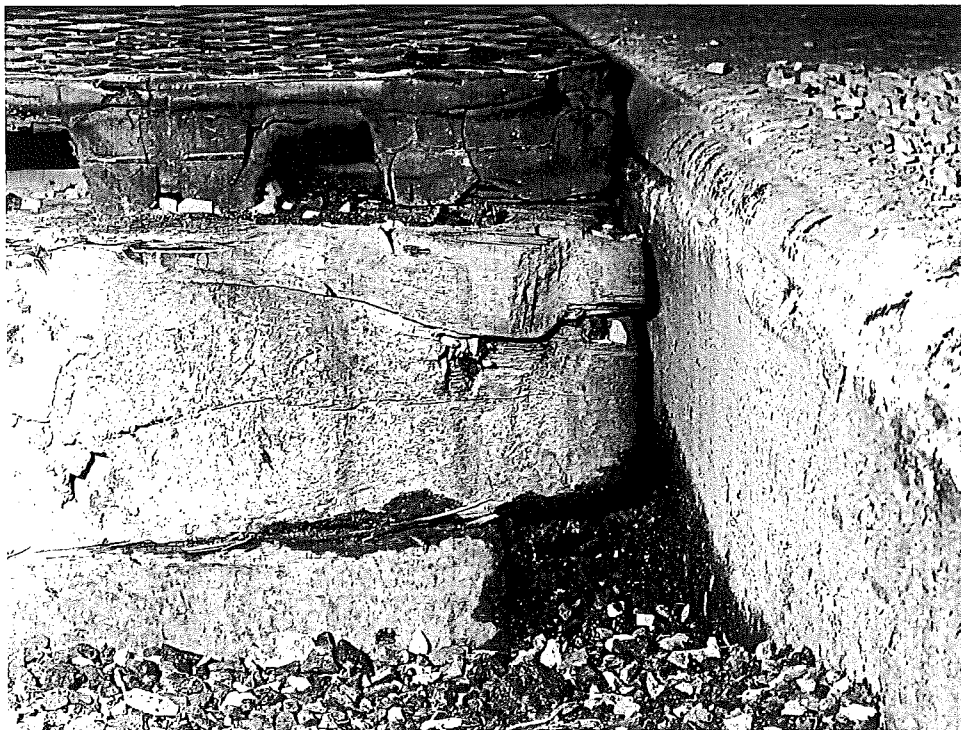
Vertical section of the crossing illustrating shim extension beyond tie end.
